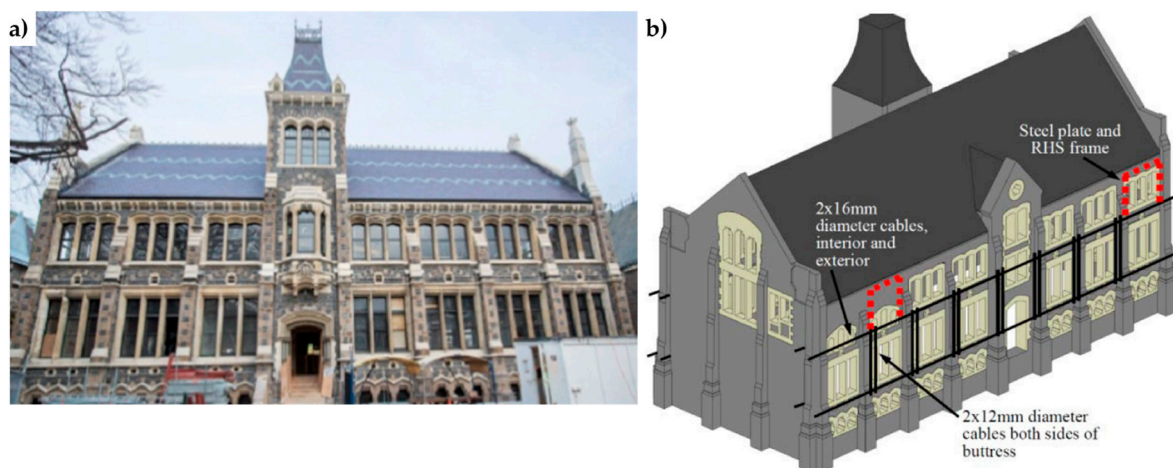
a) Christchurch Arts Centre, Chemistry building (New Zealand); b) Horizontal and vertical cables for external post-tensioning were paired with companion horizontal tendons running parallel on the inside of the wall, in order to enhance a frame-type action of building response.
